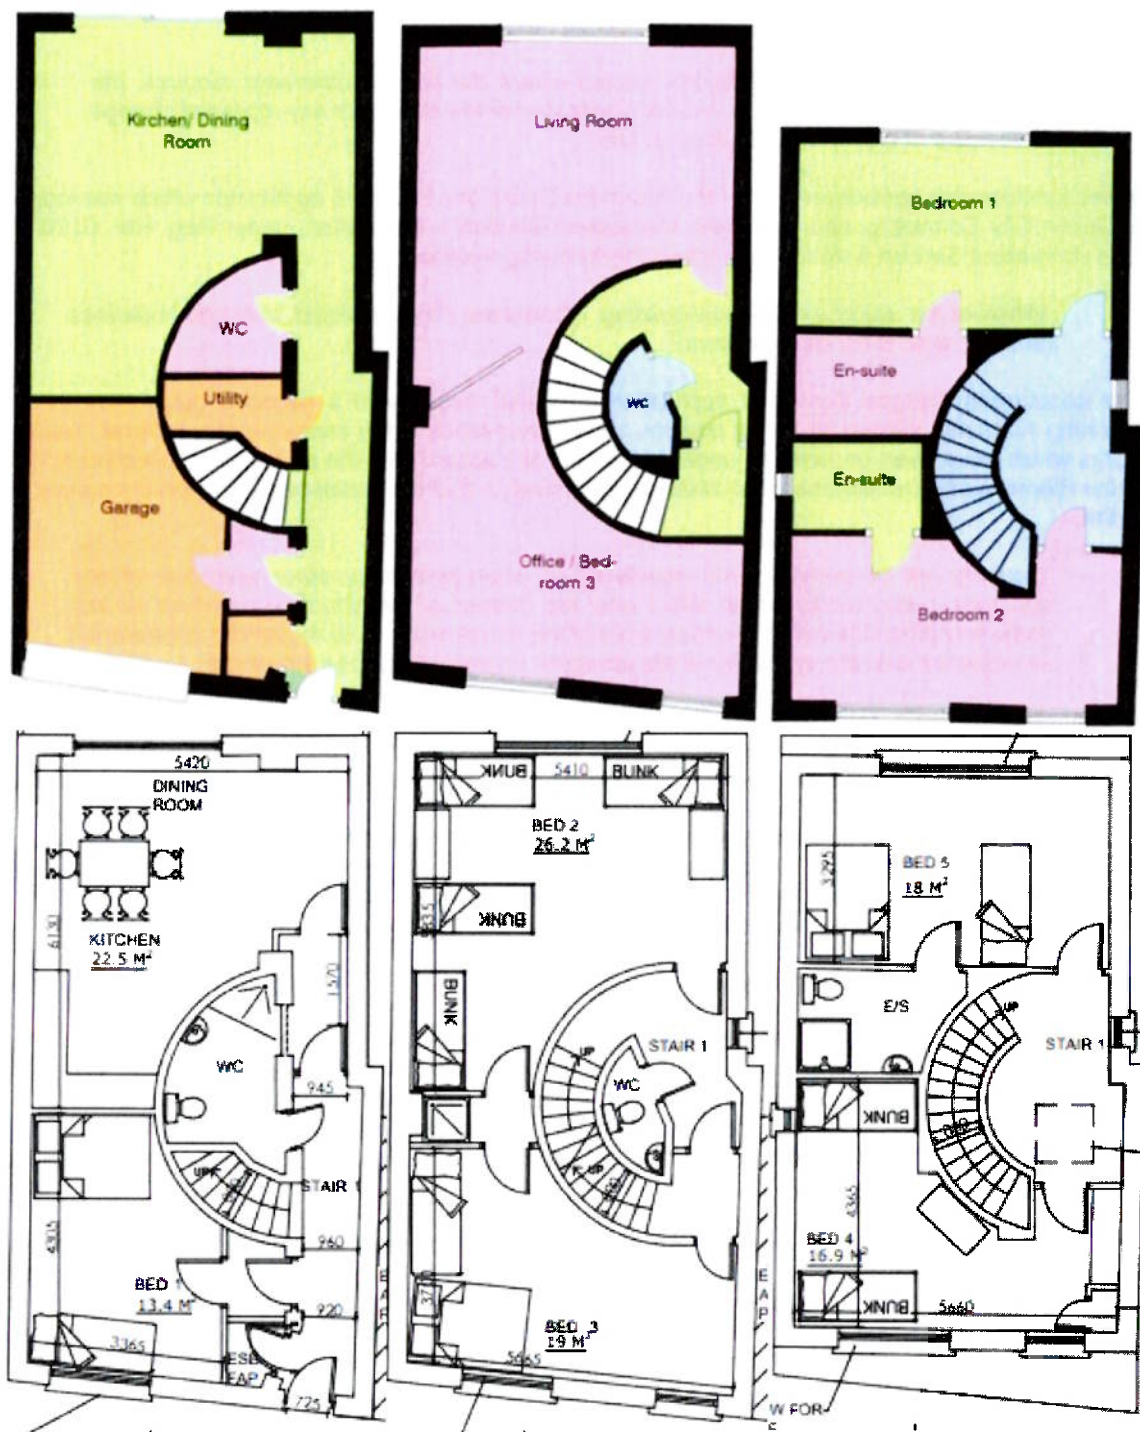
Ground (l), first (centre) and second (r) floor plans of 27 Hatch Place as approved under Reg. Ref. 2307/14 (top) and as existing (bottom).
